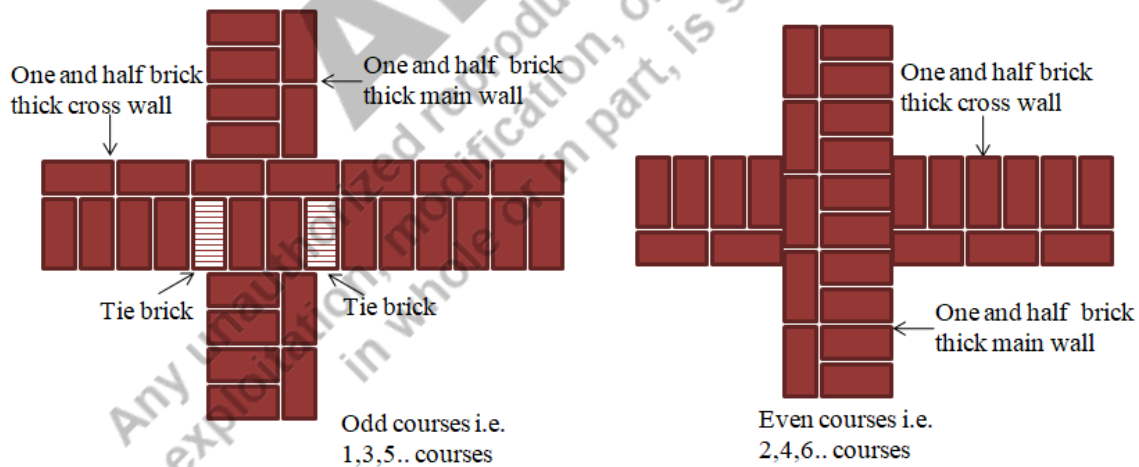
(b) Cross junction between two one and a half brick thick walls
